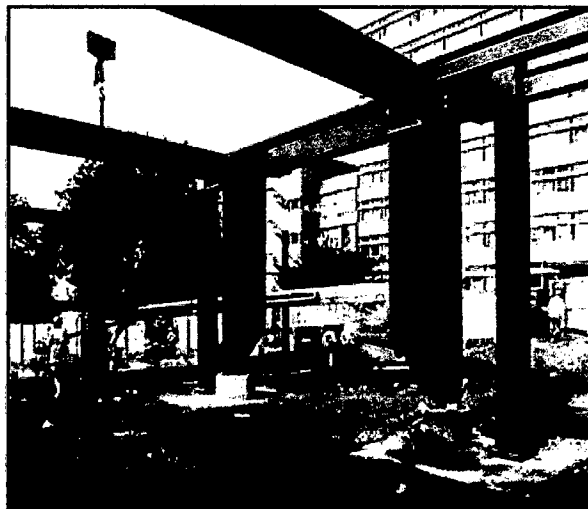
Another typical rectangular frame, which consists of two (2) columns and a horizontal beam, prefabricated using steel sections
